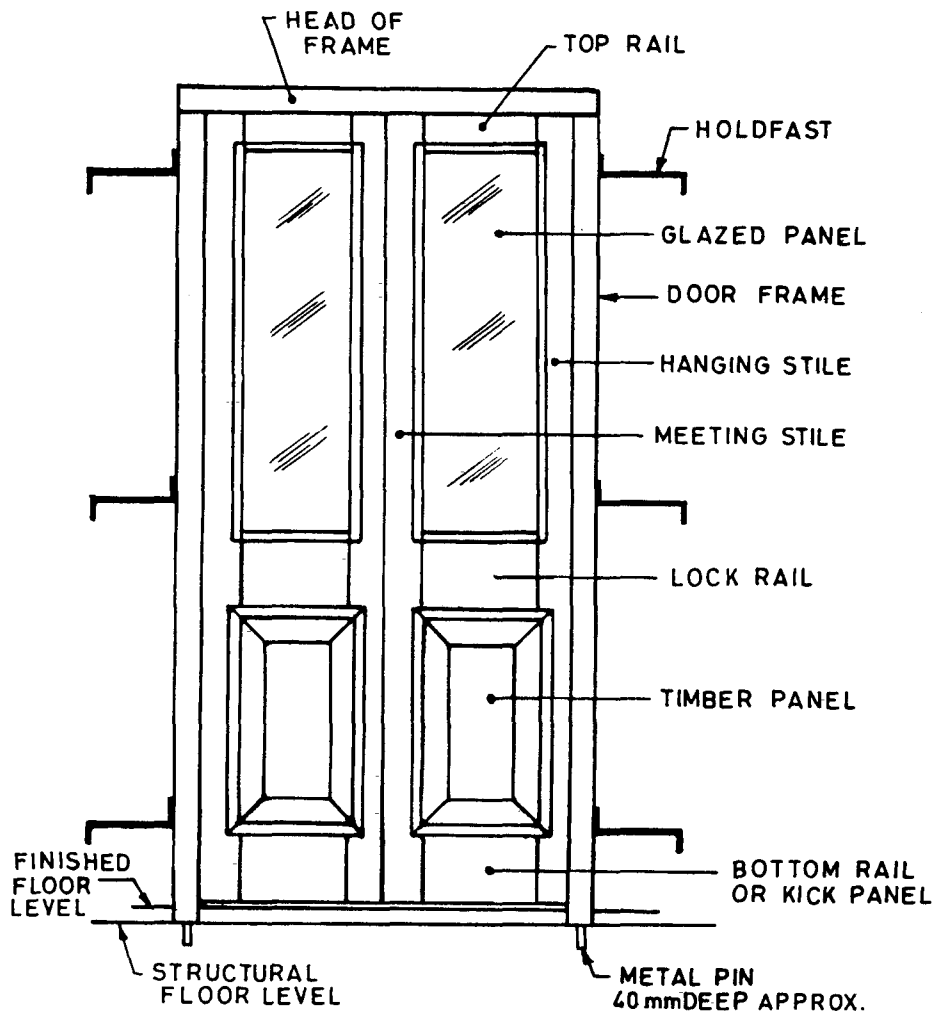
TYPICAL ILLUSTRATION OF DOUBLE PANELLED DOOR WITH
